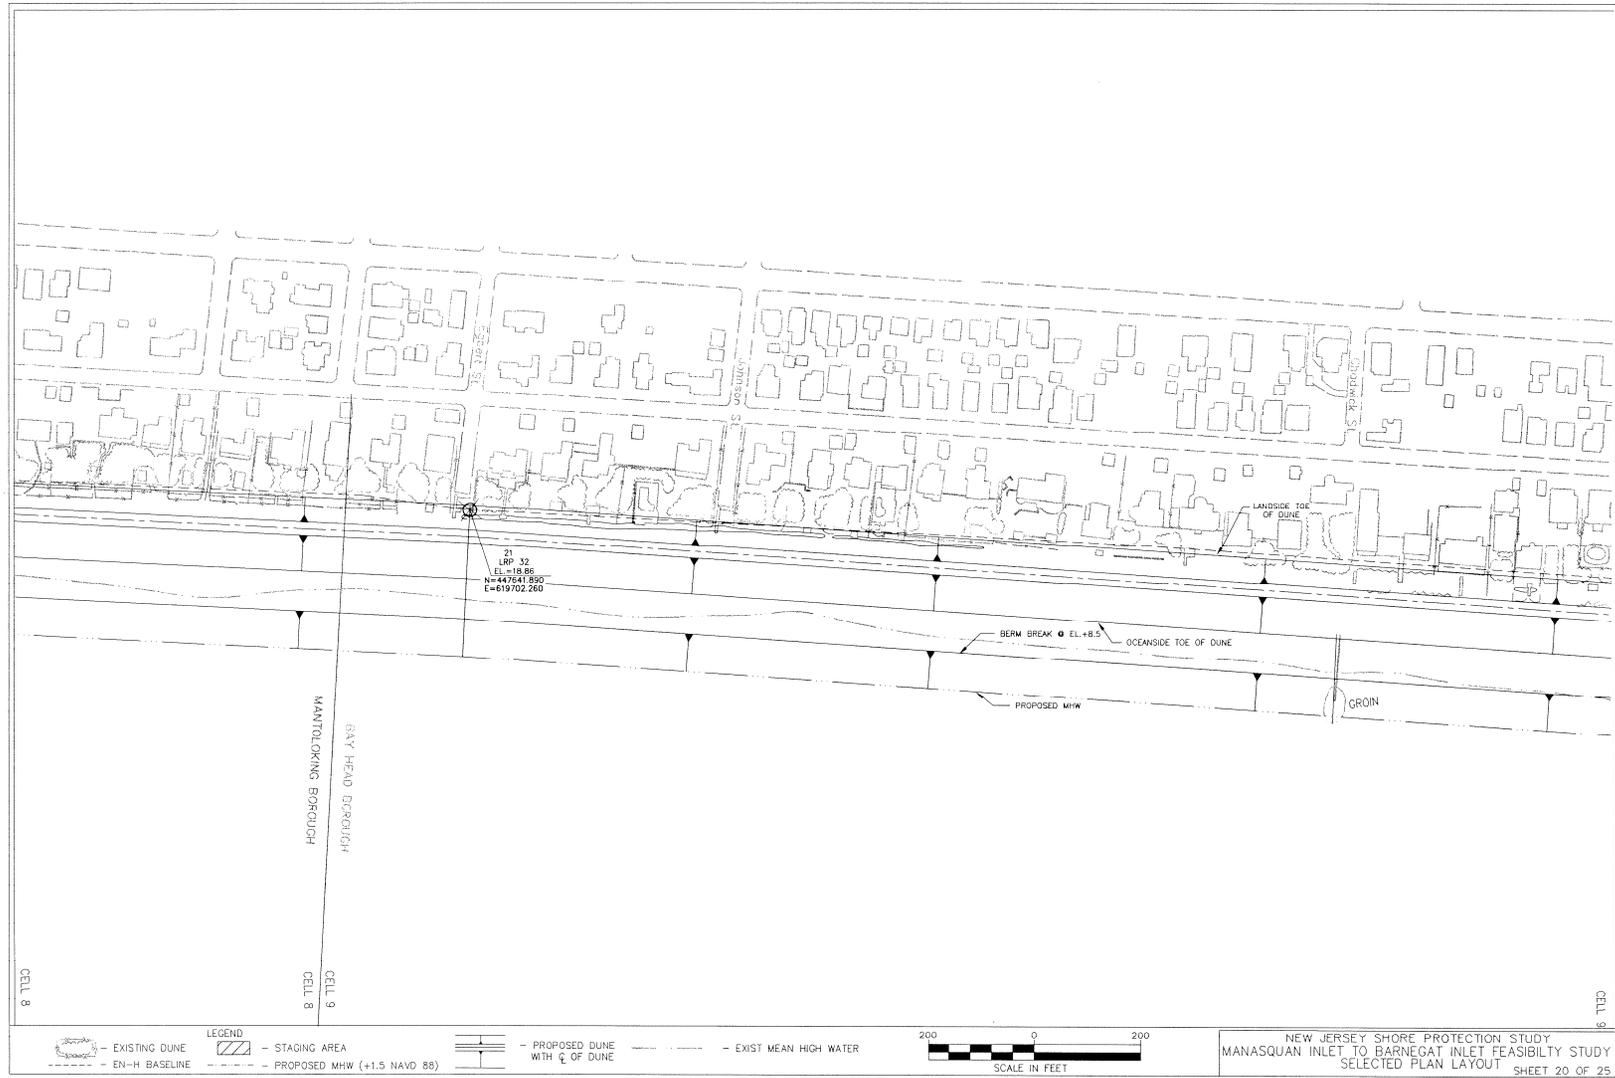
Selected Plan Layout – Mantoloking Borough to Bay Head Borough
